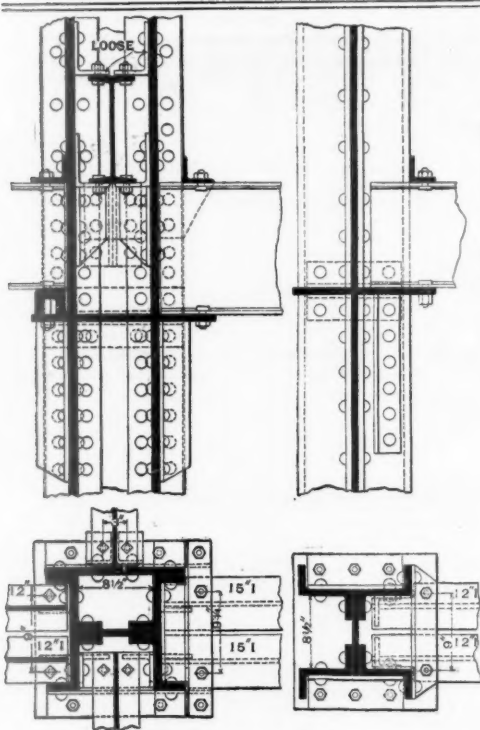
Beam Connections to Columns for Monadnock Building, Chicago.
